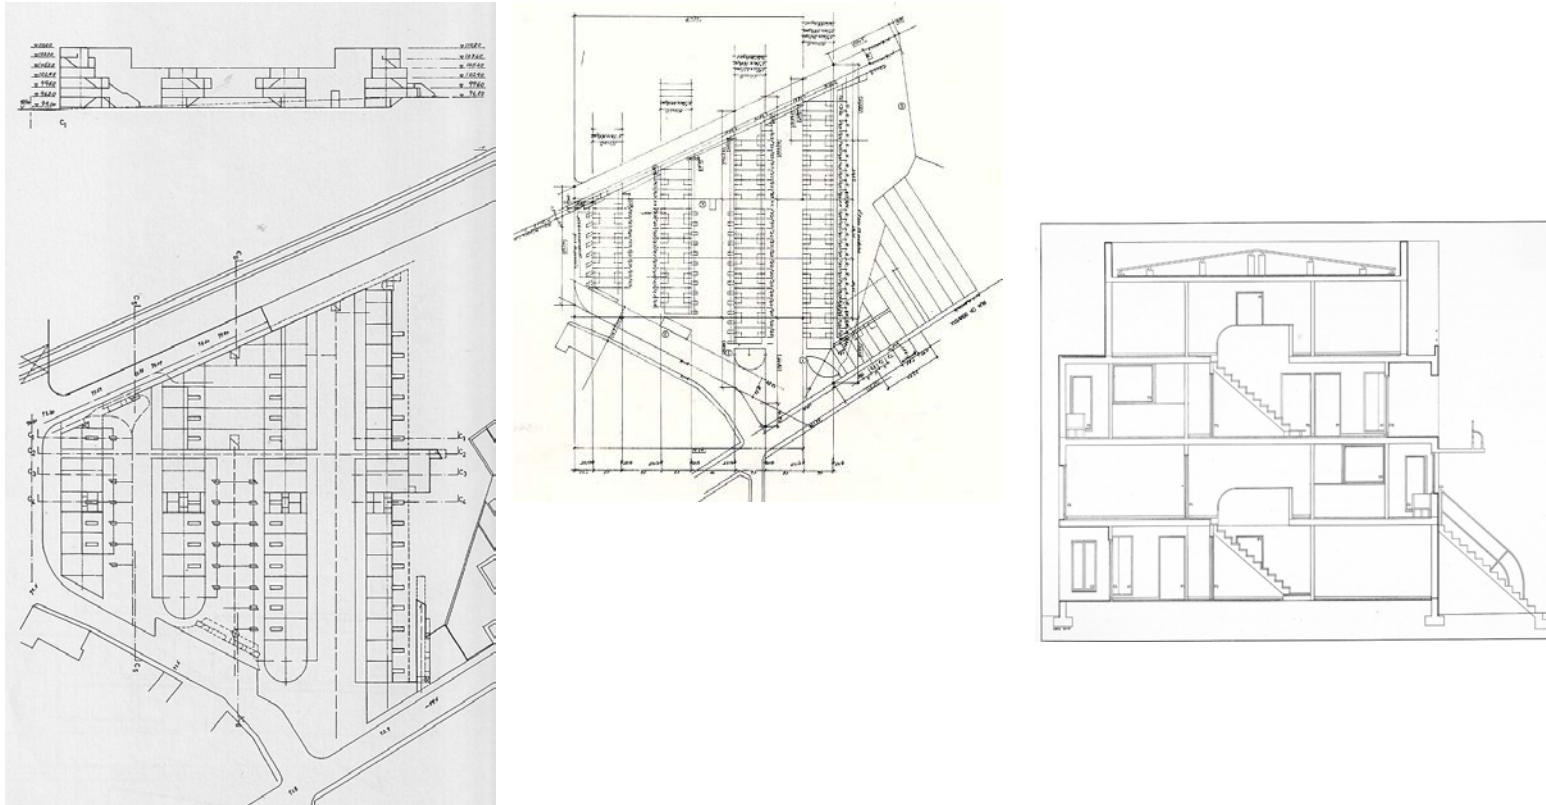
Plan and schematic section of Bouça housing, 1973; plan and section of Bouça SAAL housing, 1976.
